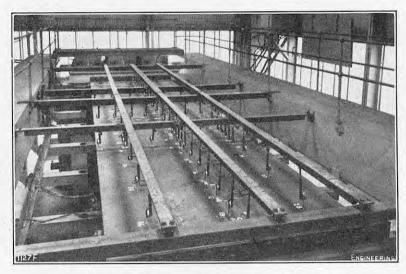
Specimen in Machine, showing Datum Bars.
